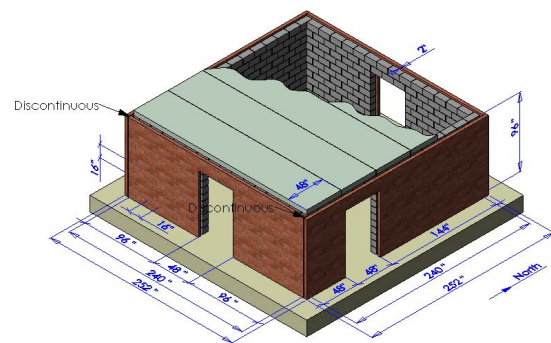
Full-size concrete masonry structure with clay masonry veneer.
